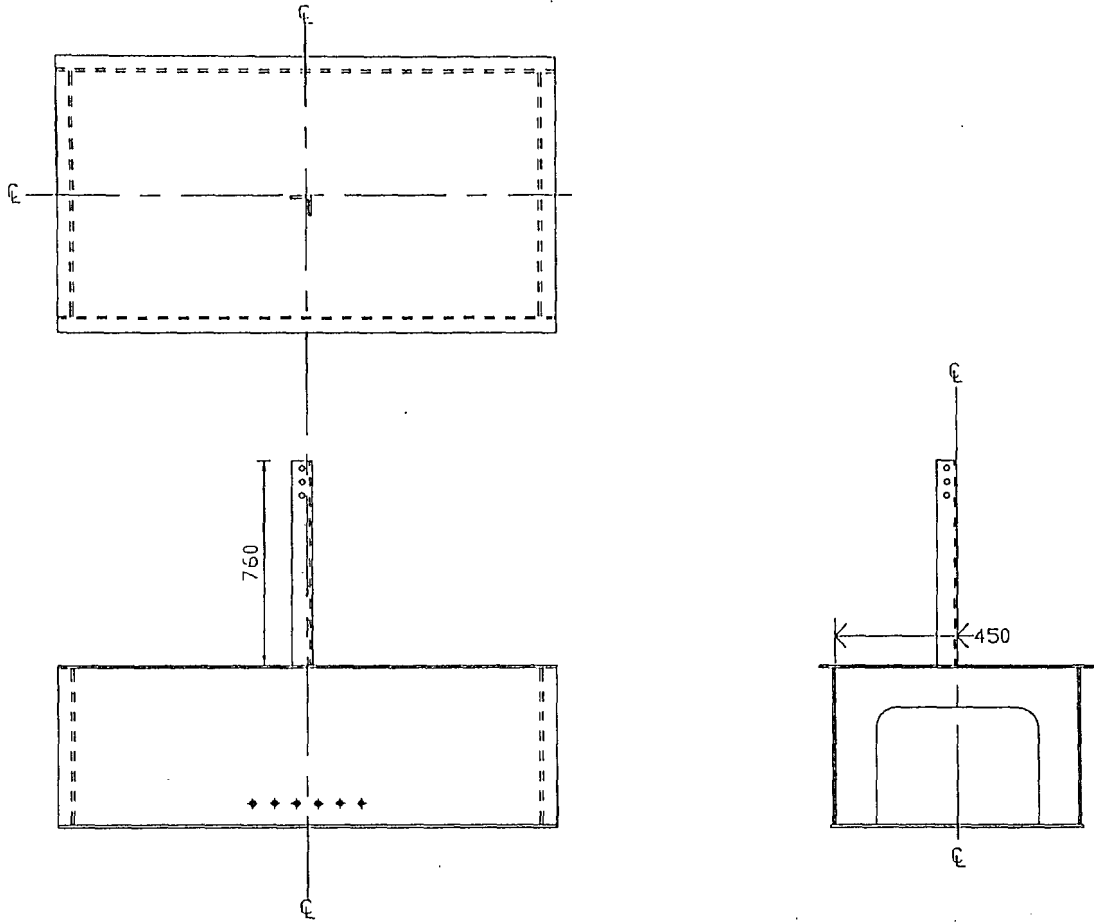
Alternate 3 - Midspan detail Axial Specimen detail drawings
